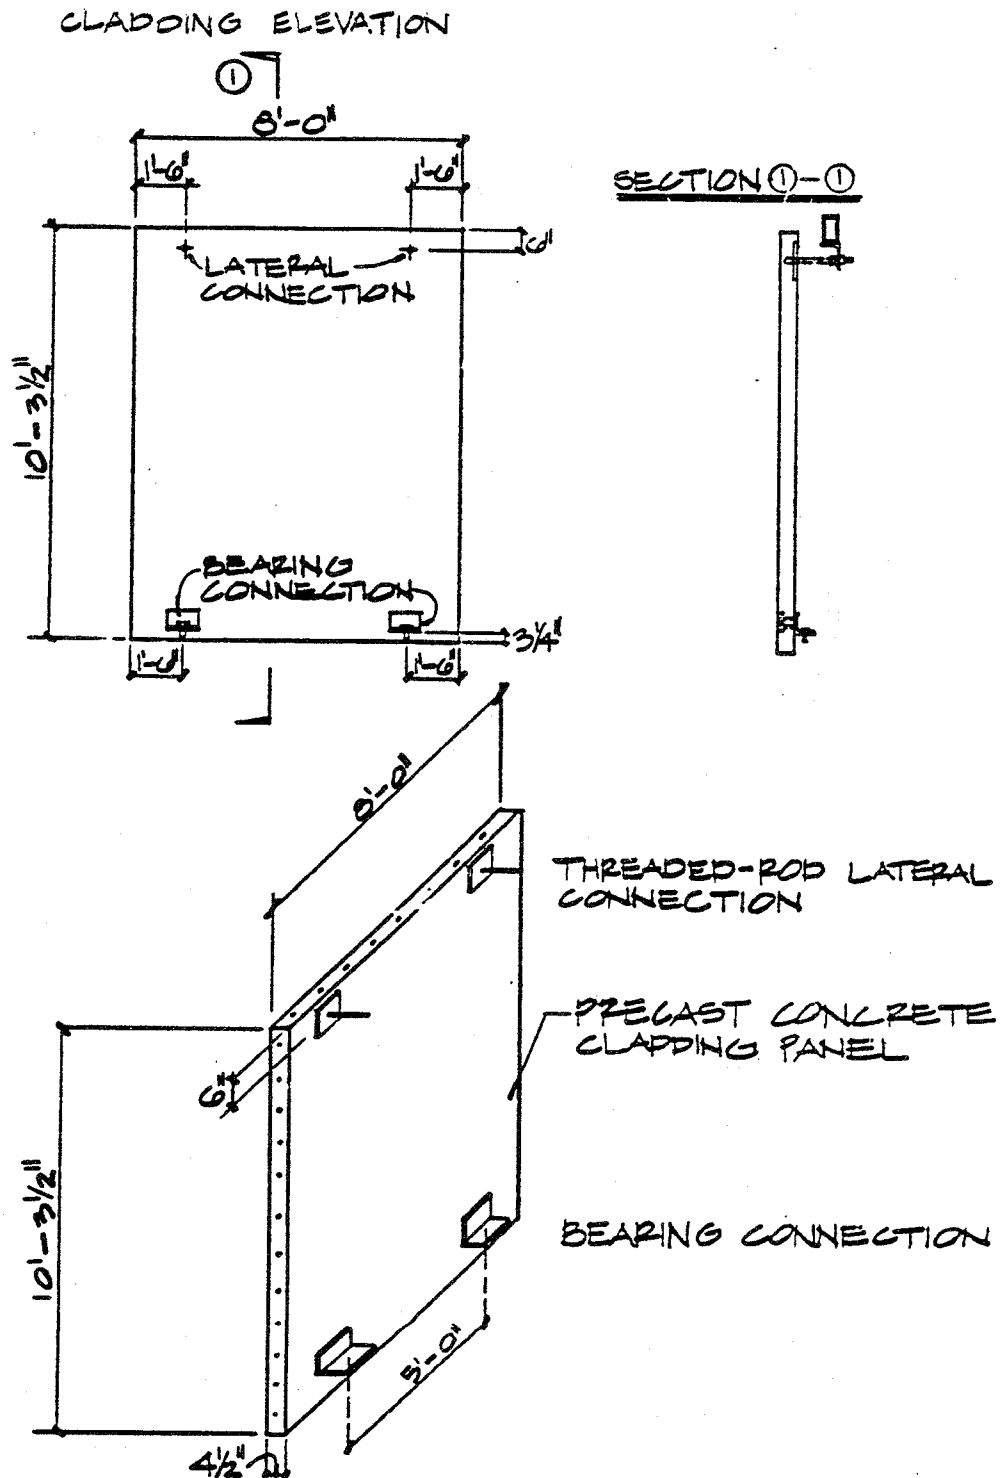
Test II: Schematic overview of precast cladding test specimen and connections (from Rihal [1988a]).
